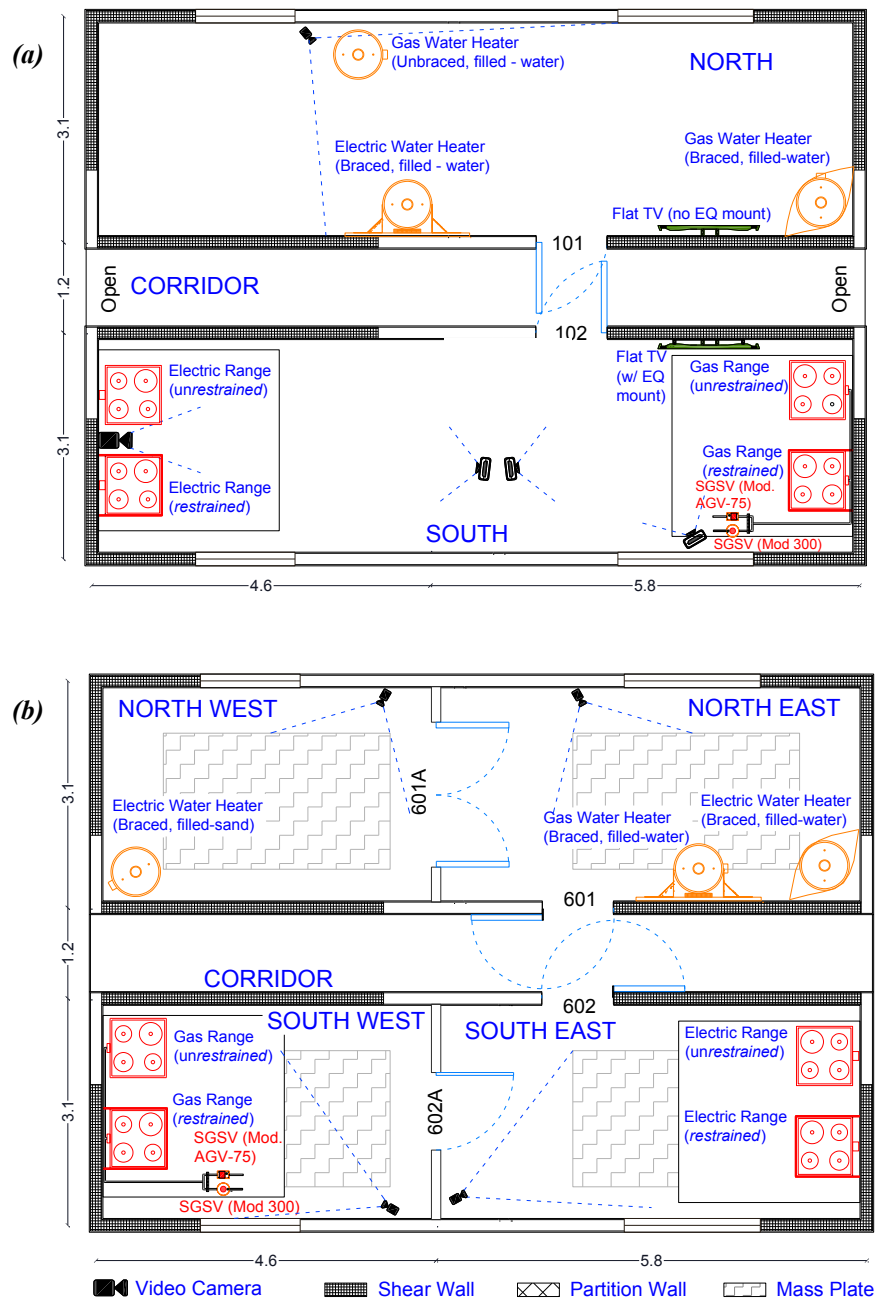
Appliance plan layout: (a) level 1, and (b) level 6 (note the hatched pattern on level 6 delineates the outline of the mass plates, and elevated wood-framed platform was placed over the mass plates).
